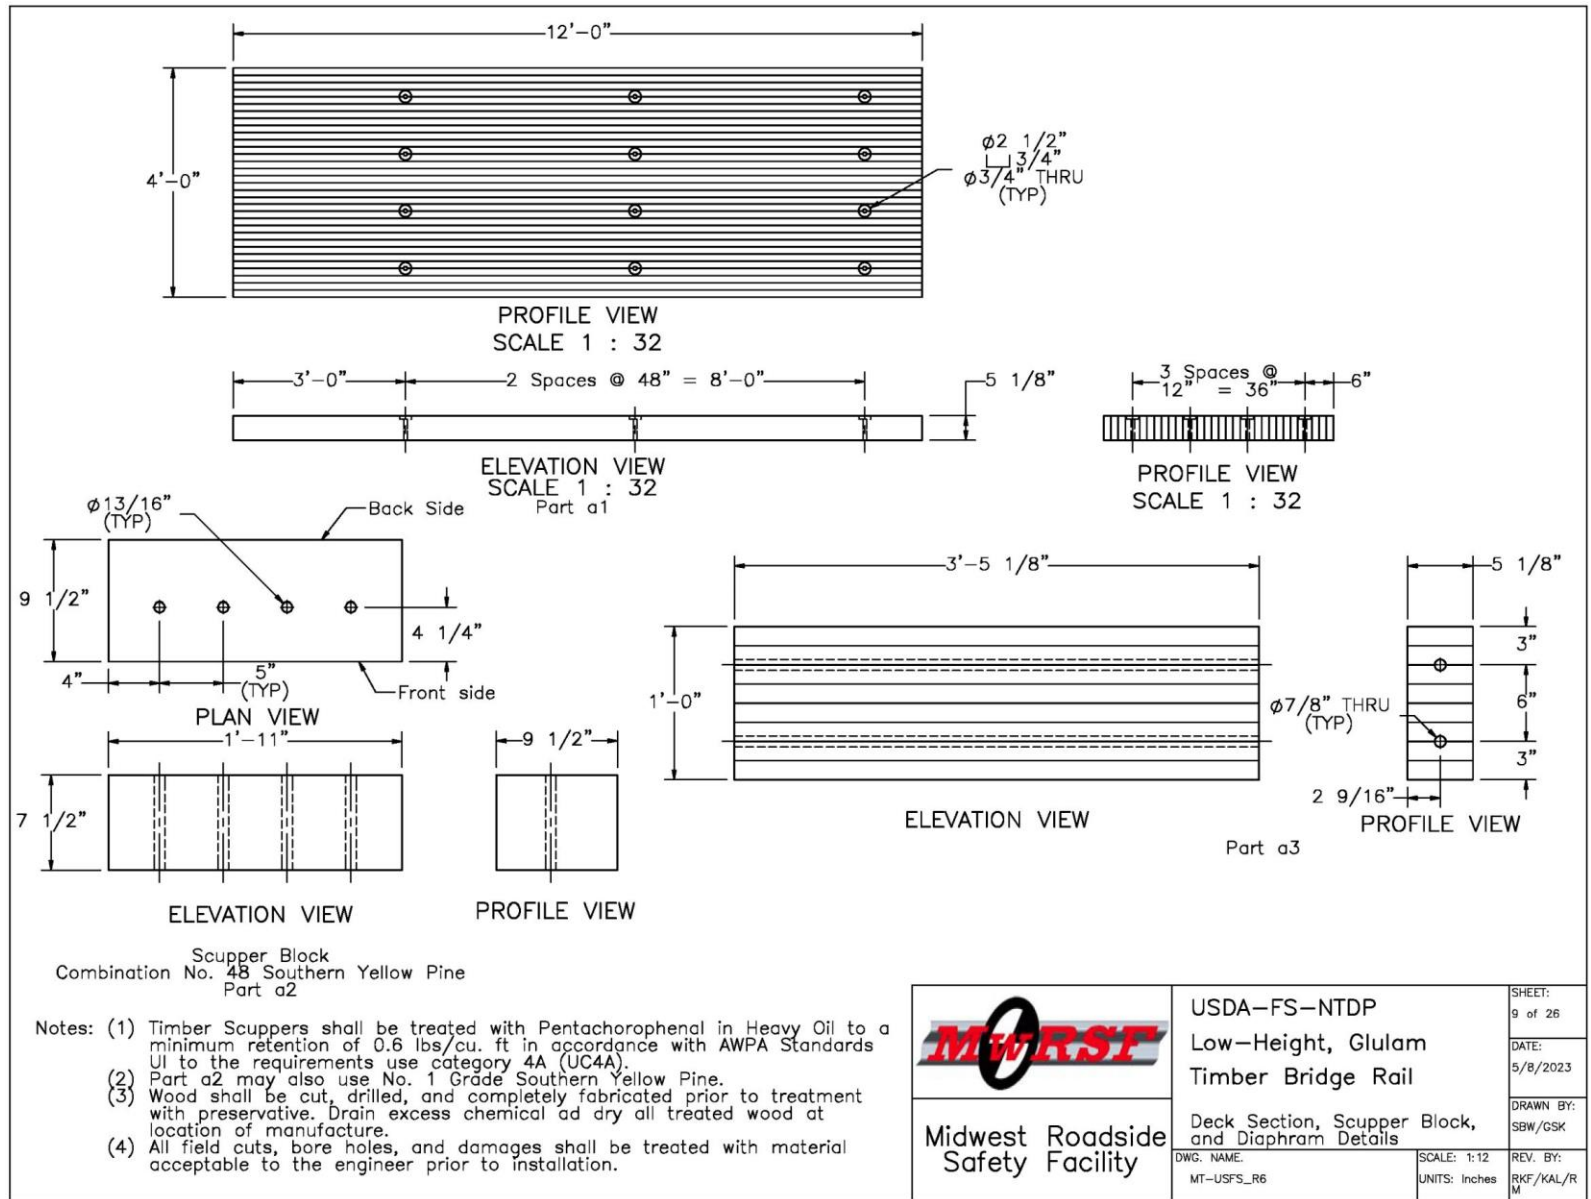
USDA-FS-NTDP Low-Height, Glulam Timber Bridge Rail: Deck Section, Scupper Block, and Diaphragm Details
